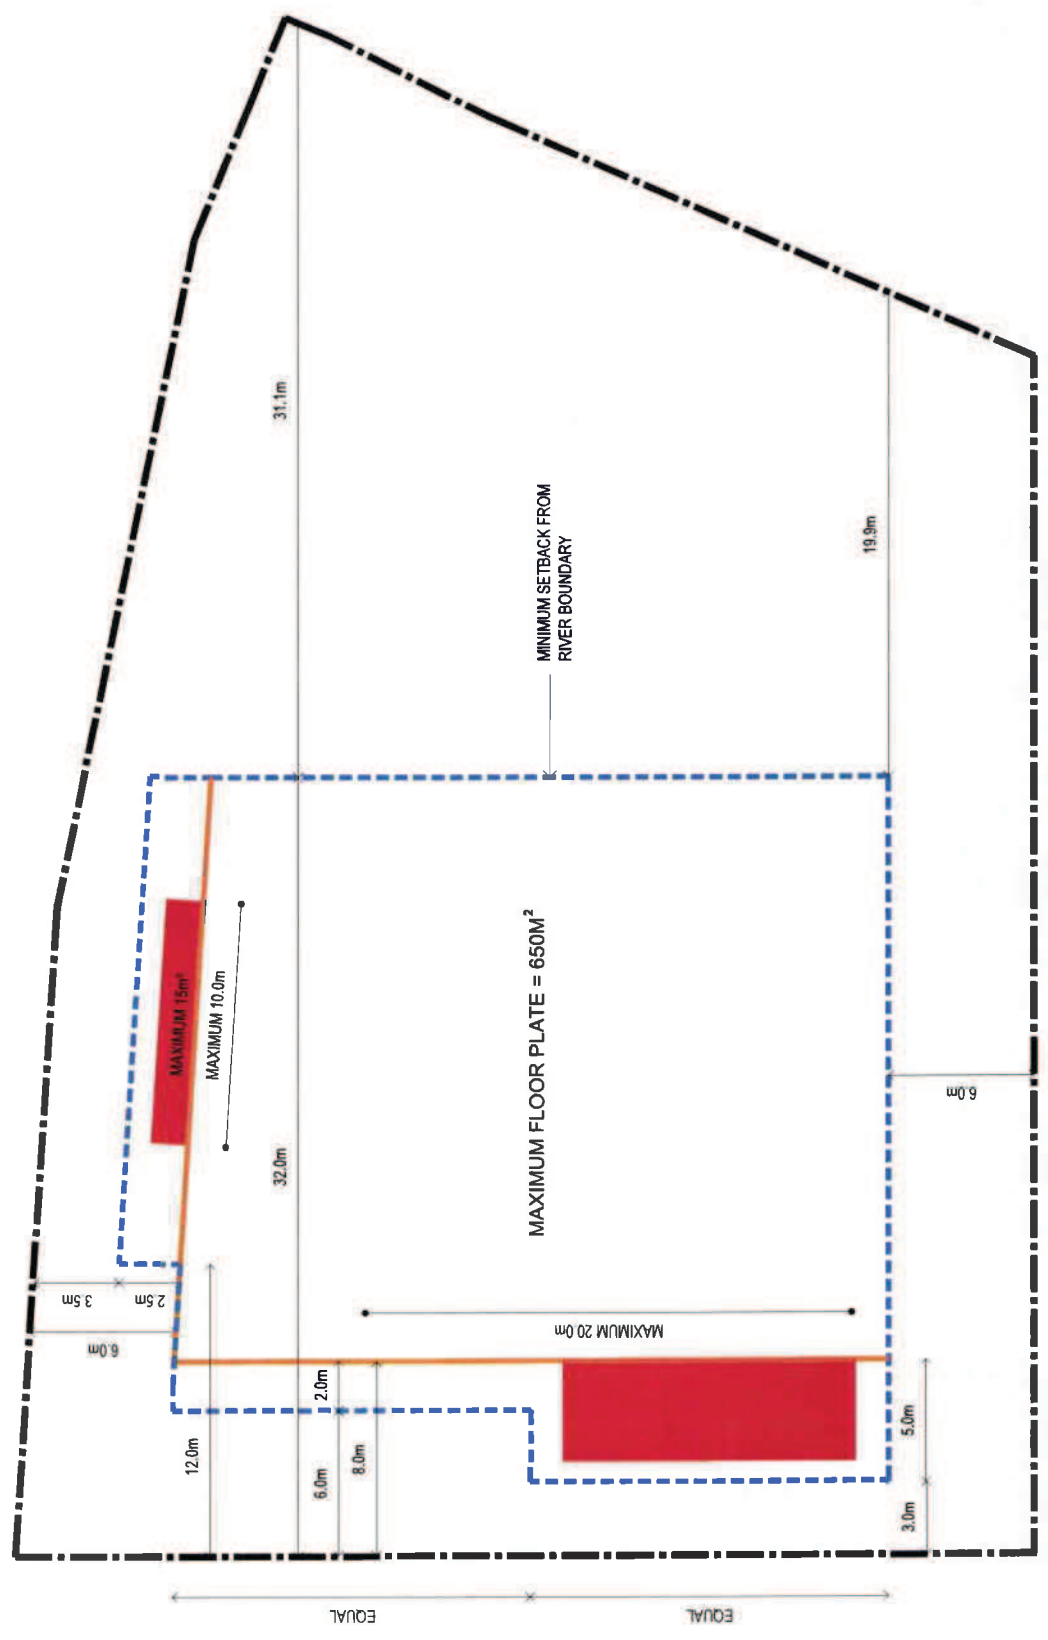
Proposed Building Envelope Controls: Lower Tower (Maximum height above ground 70m)
